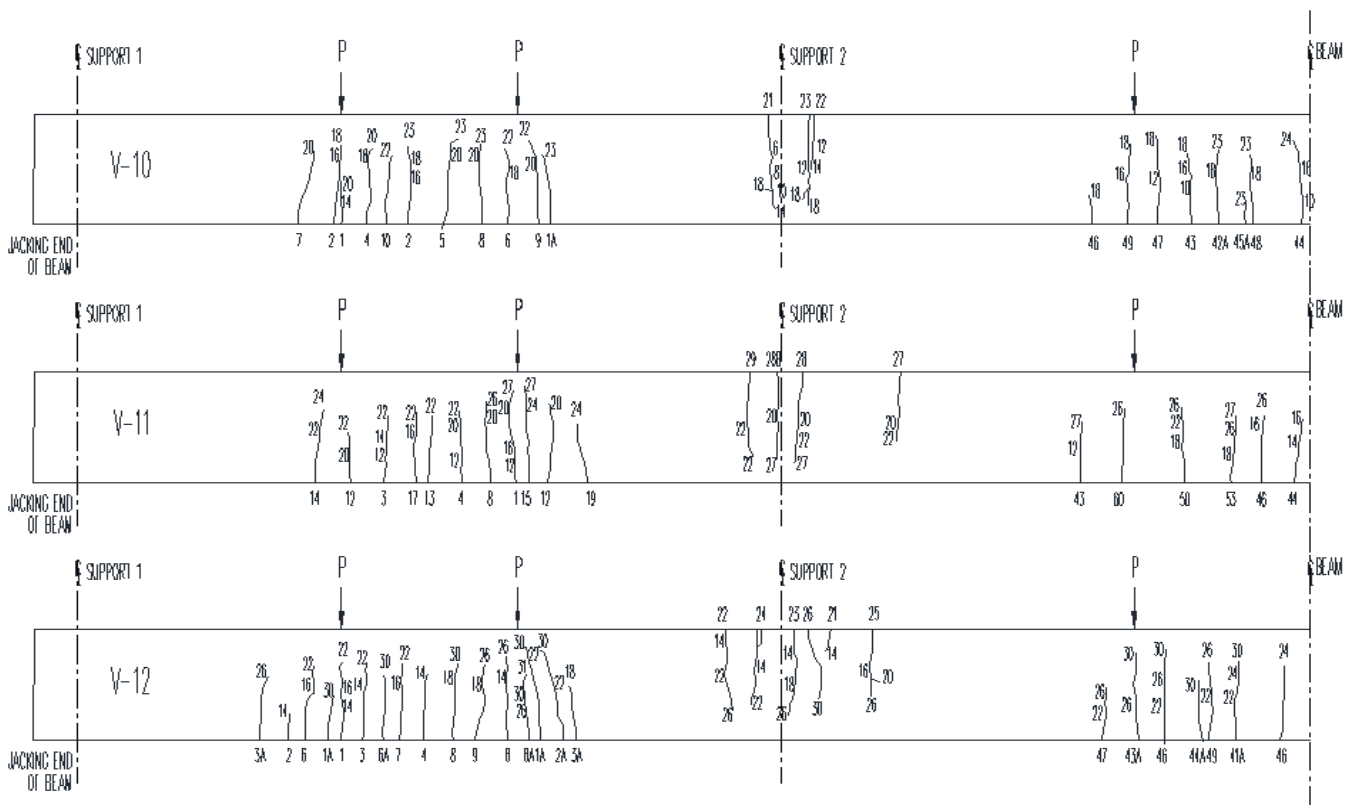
Typical location of cracks in beams V-10, V-11, and V-12 (500 × 150 mm). Half elevation left side.
